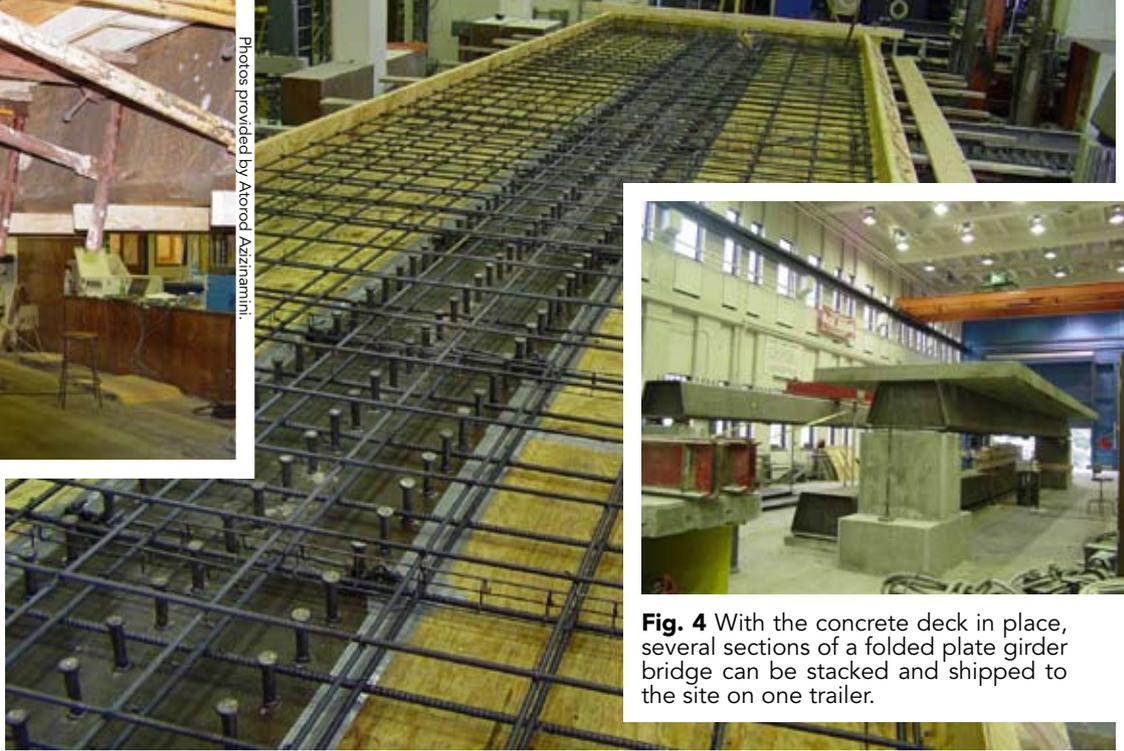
A folded plate girder with deck forms and reinforcing steel in place. Note the studs on the girder and the sizable work platform it provides.
